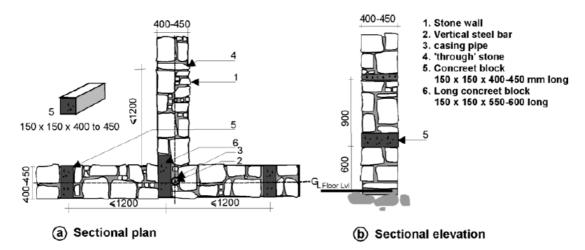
'Through' stone or bond elements in stone wall built in mud mortar
